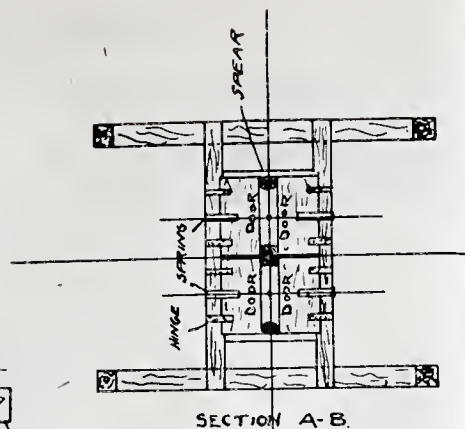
shows safety doors used in connection with the Walker hooks on man shaft No. 1 colliery. The doors are placed about four feet below the bottom of the cage, when the Walker hook has engaged the hawse pipe.
